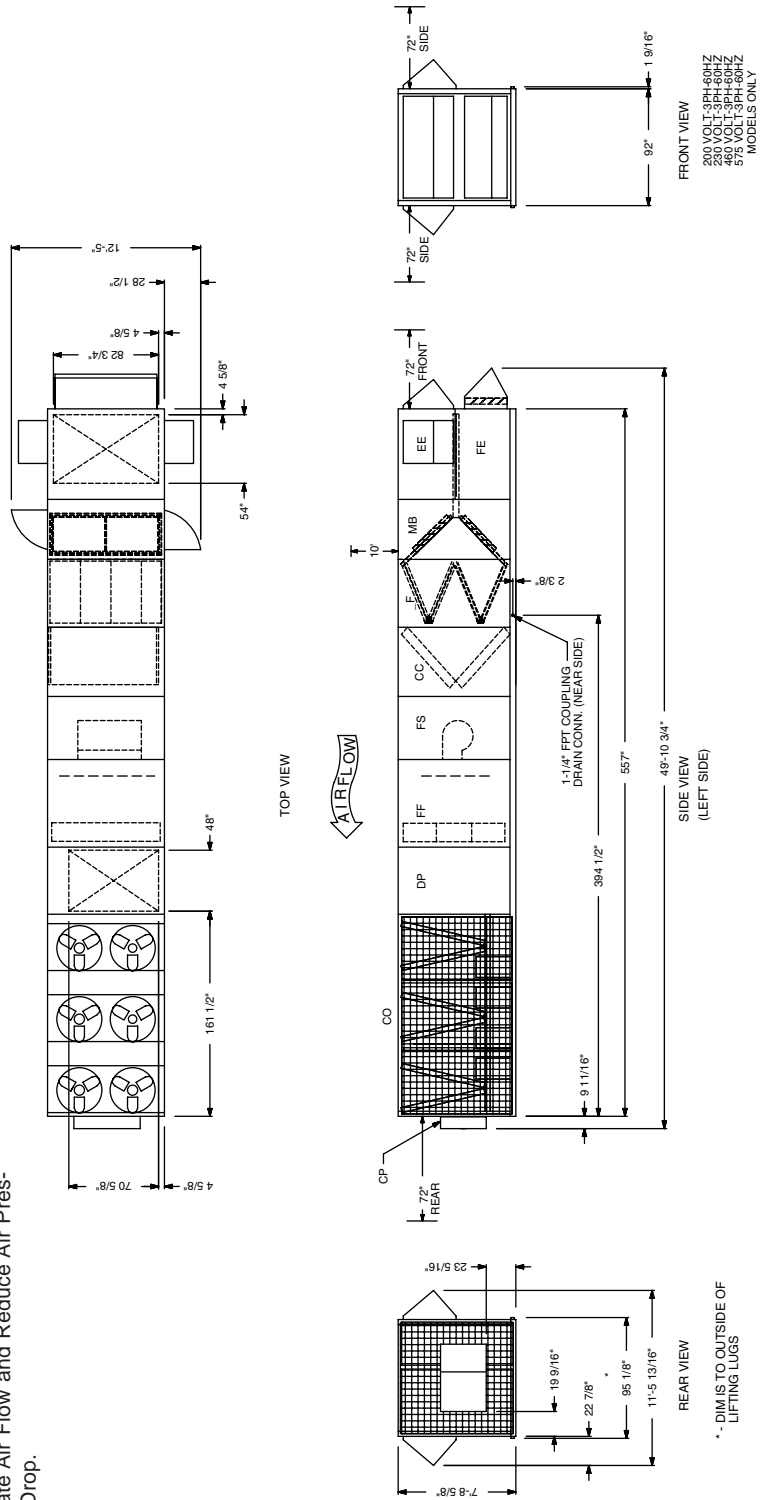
GENERAL ARRANGEMENT DRAWING
